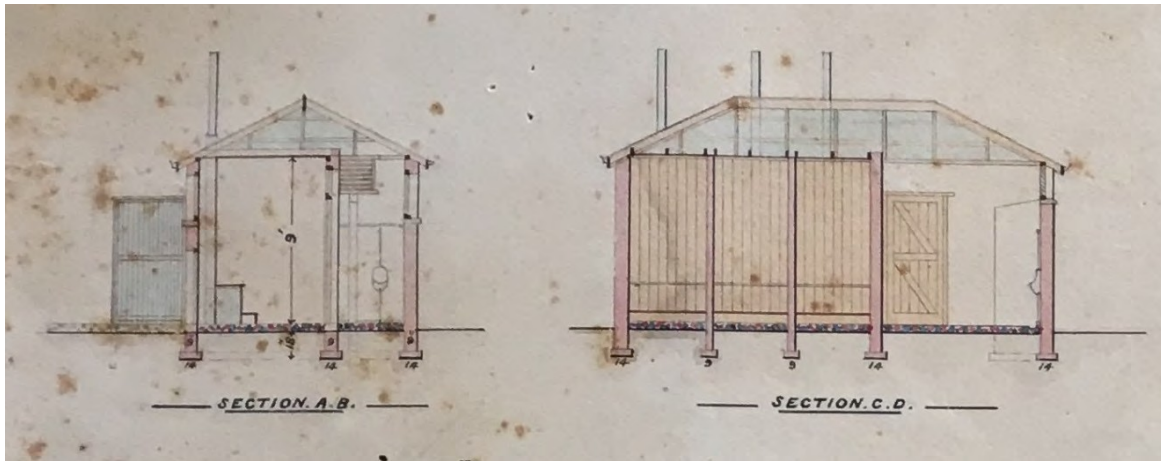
Original 1886 elevation and section of gentlemen's toilets. Source: QSA Series 17692 Plans of Queensland Railway Station Buildings etc., Item ID 120966.
